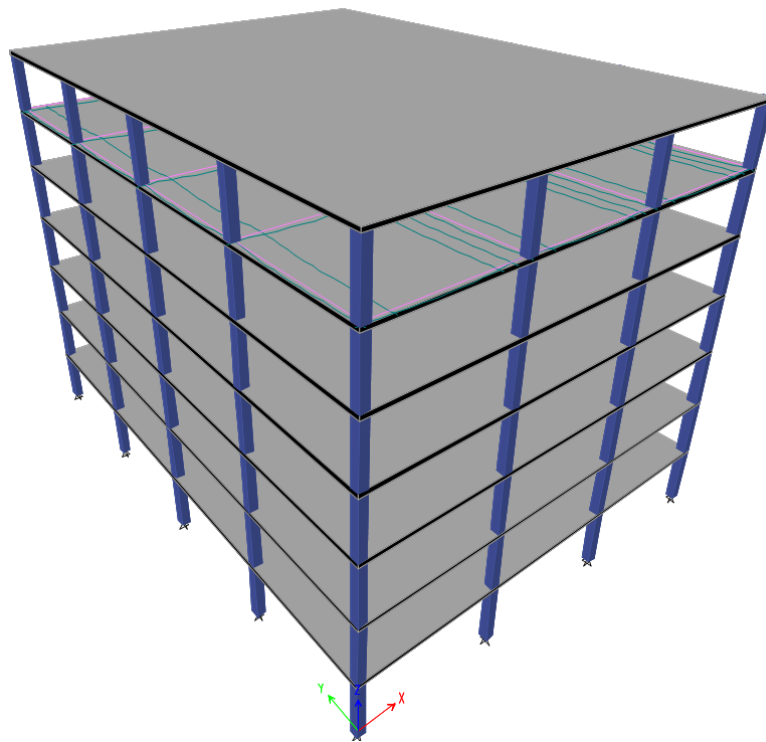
3D view of the post-tensioned slab and its support arrangement.
